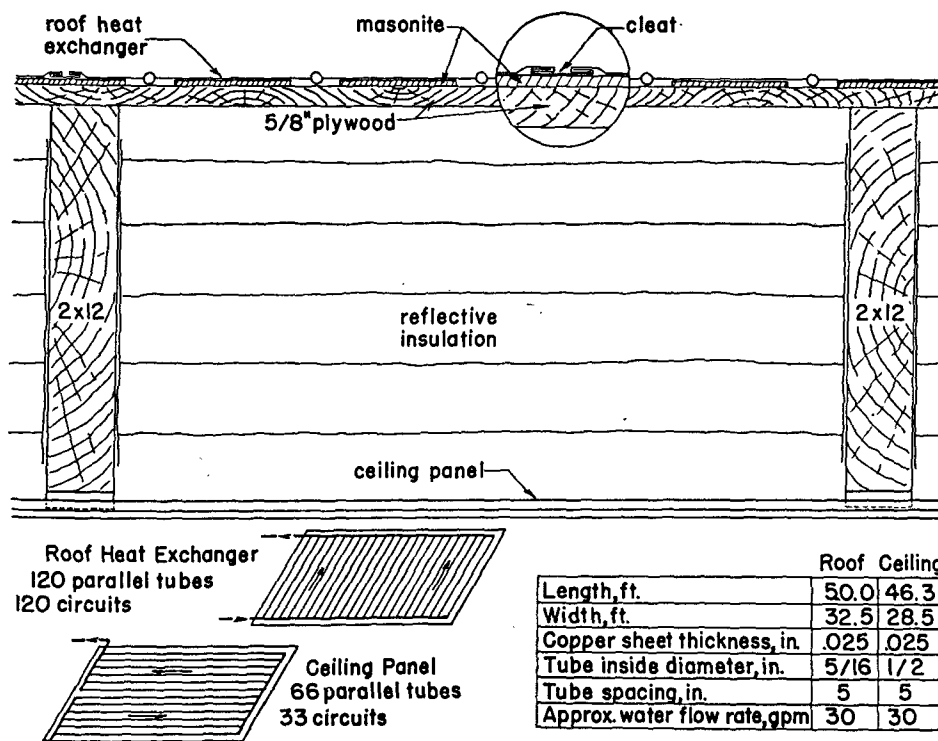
Some construction and dimensional details of roof panel and ceiling panel
